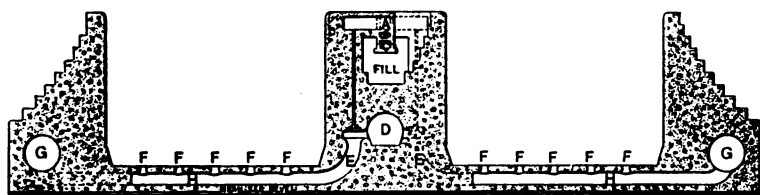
TYPICAL CROSS SECTION THROUGH LOCKS.
